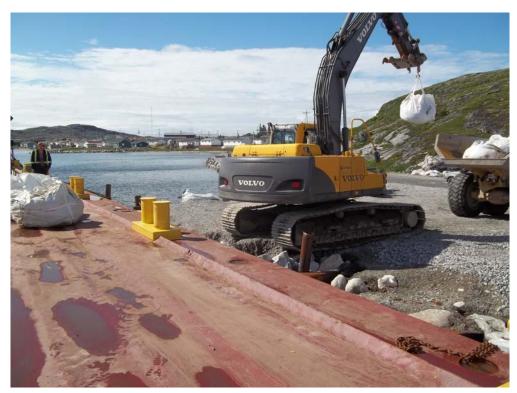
Loading soil bags onto barge at the polishing plant wharf on August 13, 2013.
